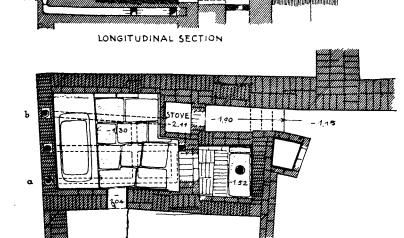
Bathroom of a House in B 3, with Heating Channels under the Floor
